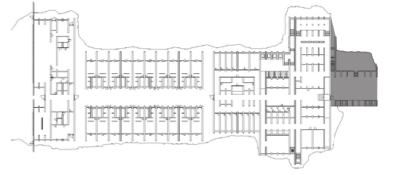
Author's own Plan of Ritual VI. 1:200 (A4)
